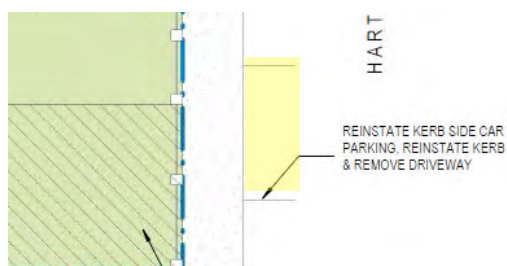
Reinstated kerbside parking in front of lot on Hartley Street (highlighted yellow) - Proposed Site Plan, prepared by Funarchi, 25/03/2026
